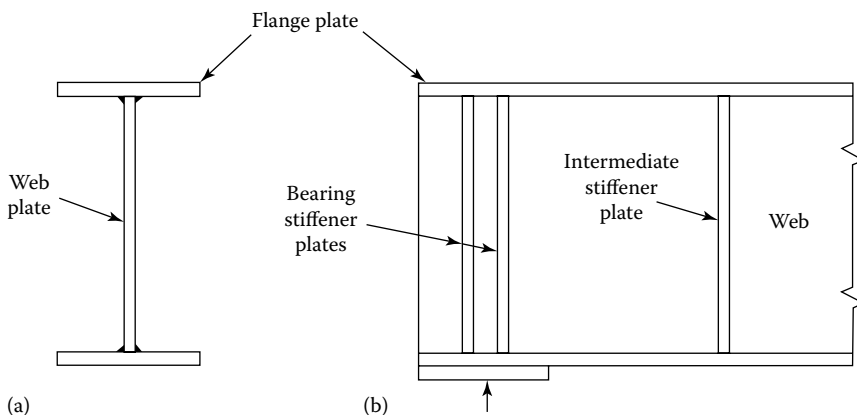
Transverse stiffeners in a plate girder. (a) Cross section and (b) elevation at end of span.
